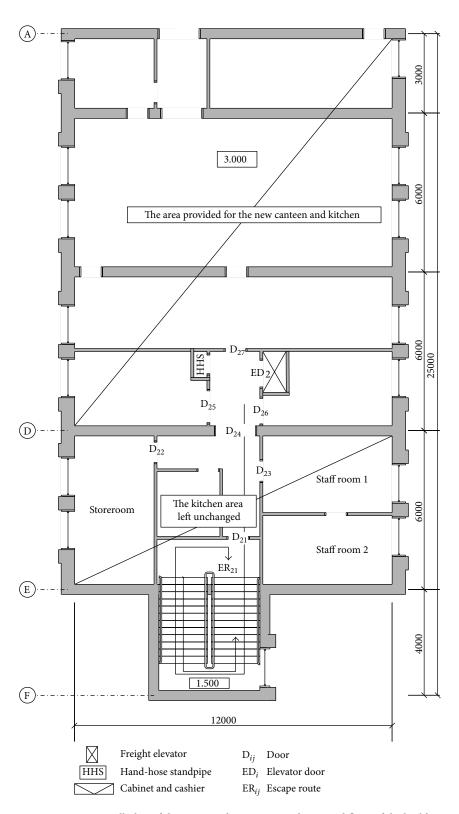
Existing wall plan of the catering department in the second floor of the building.
